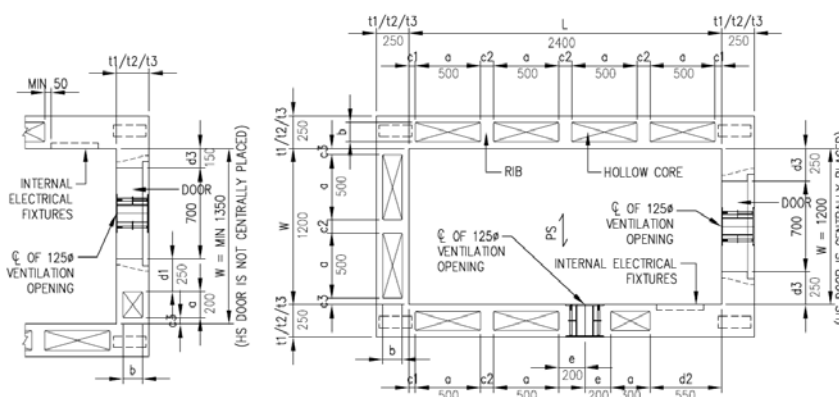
PRECAST HS WITH HS DOOR ON LONGER WALL AND ONE OF VENTILATION SLEEVE ABOVE THE DOOR (TYPE 1)
